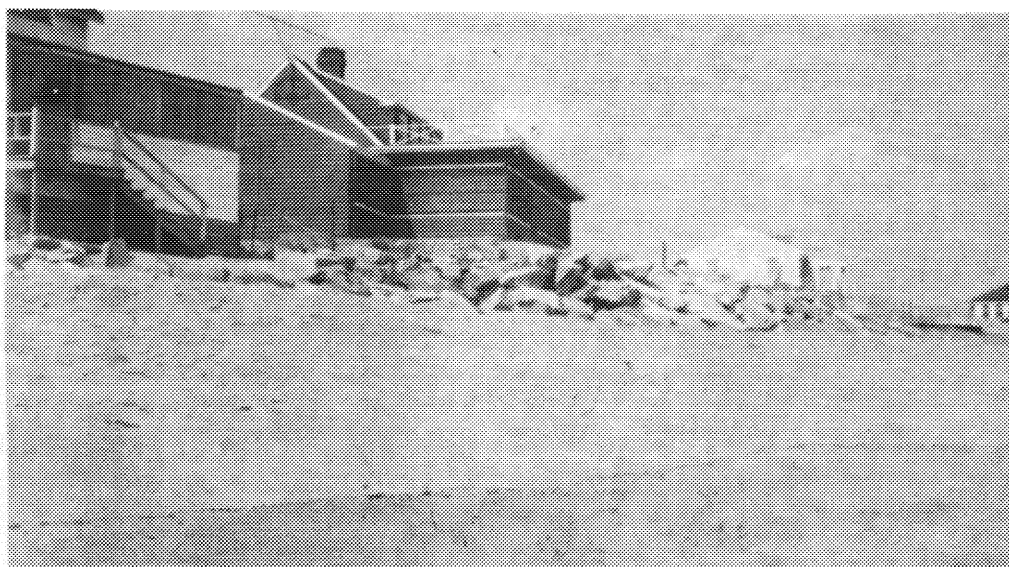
12 Sept. 1966. Rip rap revetment fronting cottage south of Groin 4.
